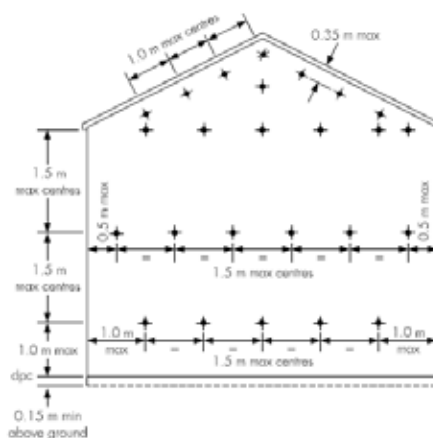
Gable Wall Drill Pattern for Insulation – 25mm holes (BBA 1998)
